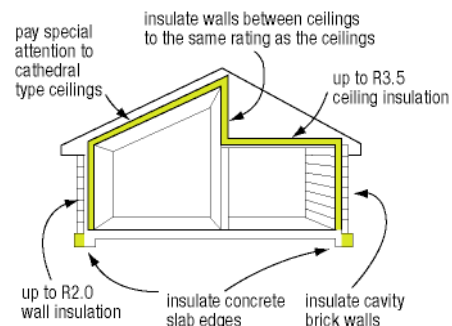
Insulate vertical wall sections between ceilings of different heights
